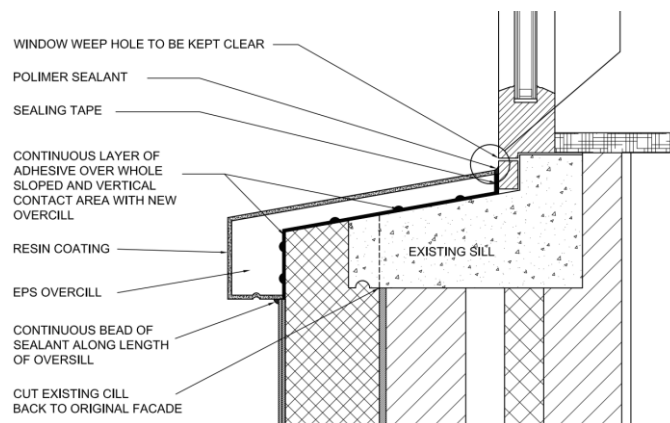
Cavity Wall Sill Detail for existing windows (Source: Passive sill)
